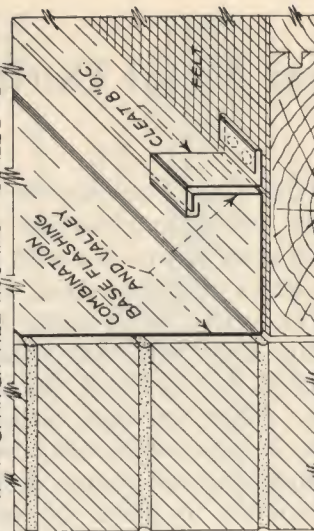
DETAIL SHOWING METHOD OF SECURING BASE FLASHING VALLEY - SCALE 3"=1'-0"
